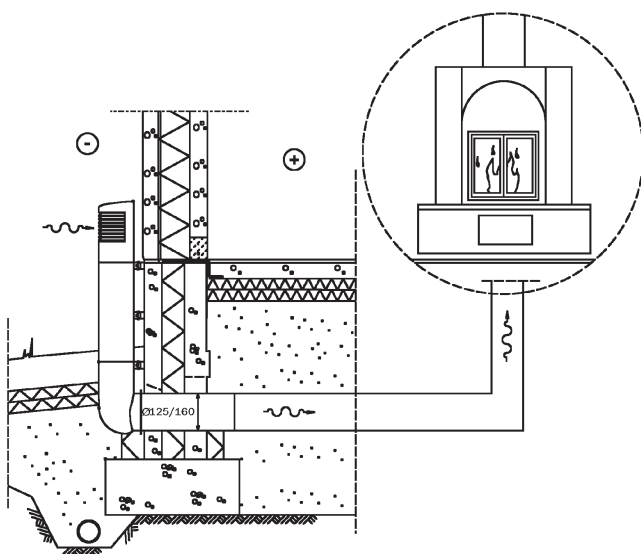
Underground air duct 'Ross' from the outside and the inside of sauna room manufactured by Finnish VILPE. The installation is well hidden from the outside.
